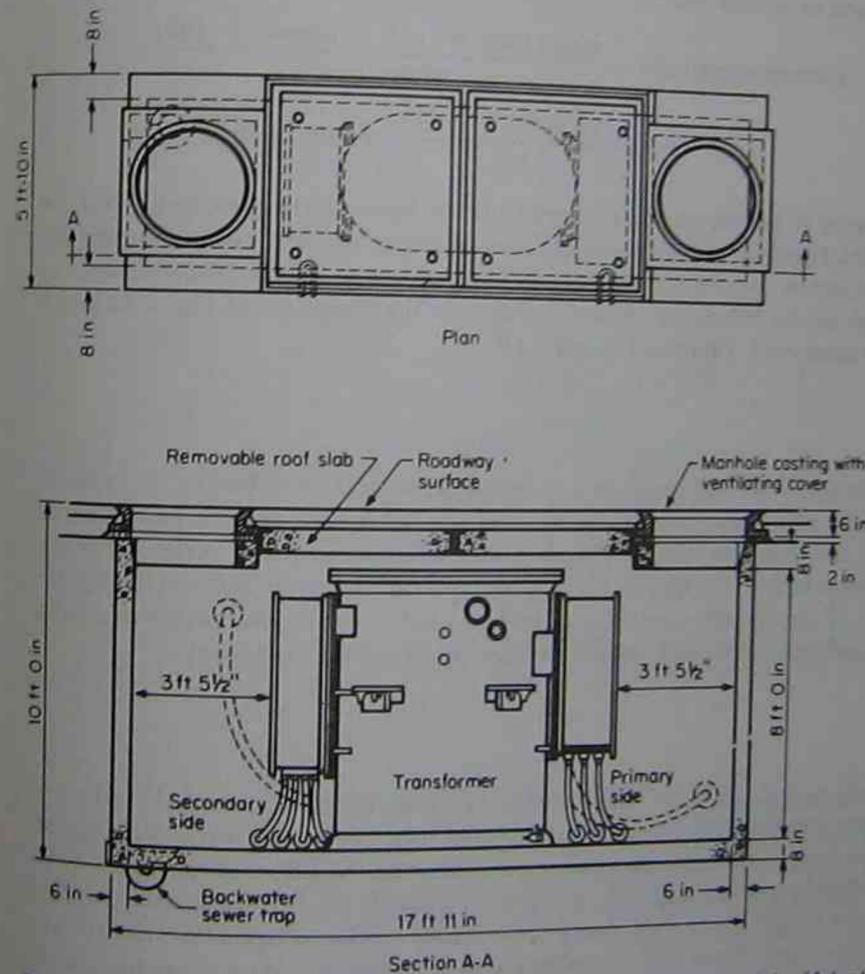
Transformer manhole under roadway, with removable roof slab. (Adapted from EEI *Underground Systems Reference Book*.)
